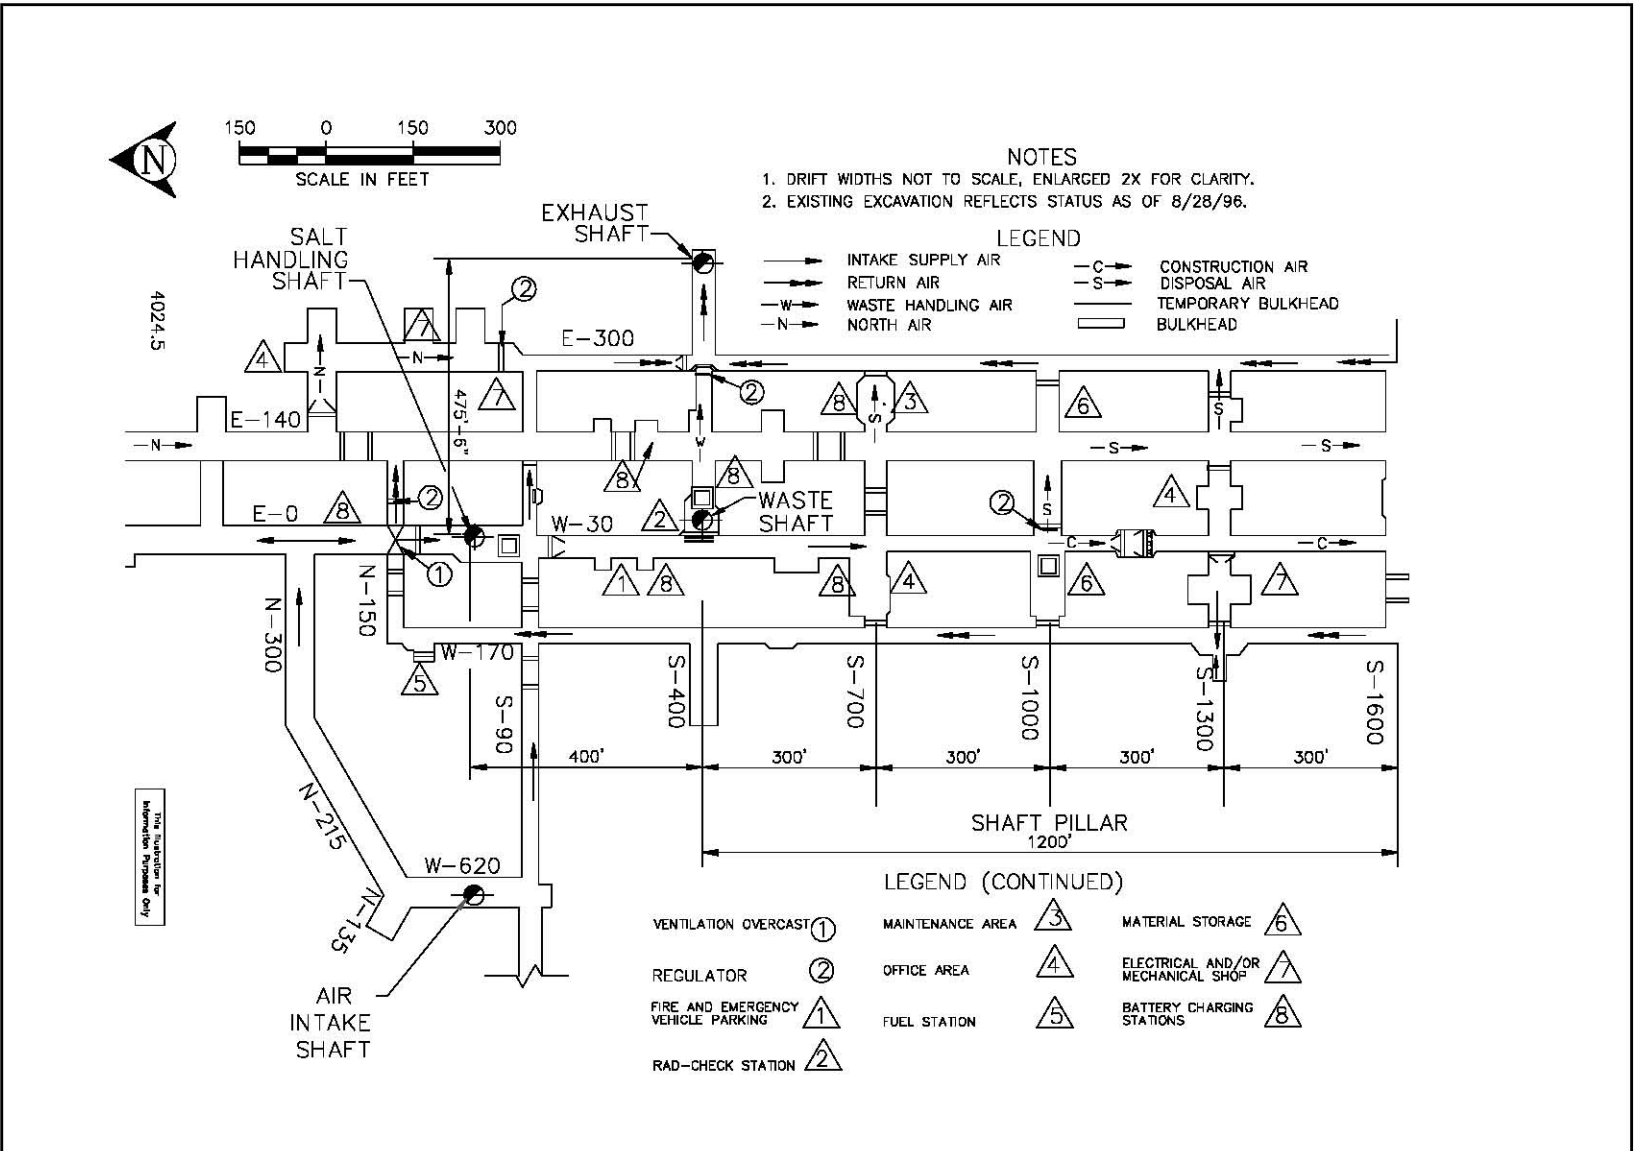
Shaft Pillar Area Layout and Ventilation Flows
